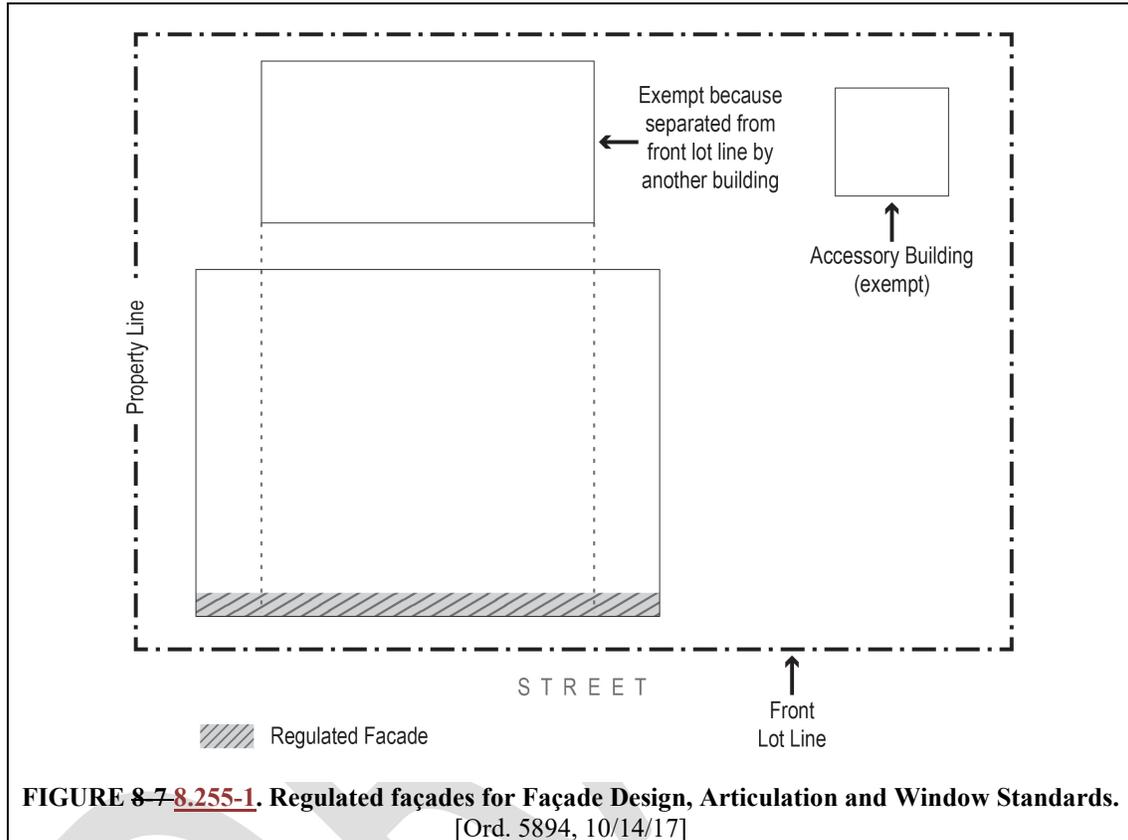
8.255-1. Regulated façades for Façade Design, Articulation and Window Standards. [Ord. 5894, 10/14/17]
